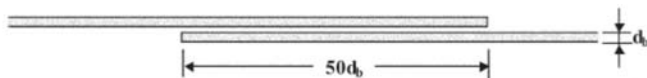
Minimum lap splice length for reinforcing bars.
